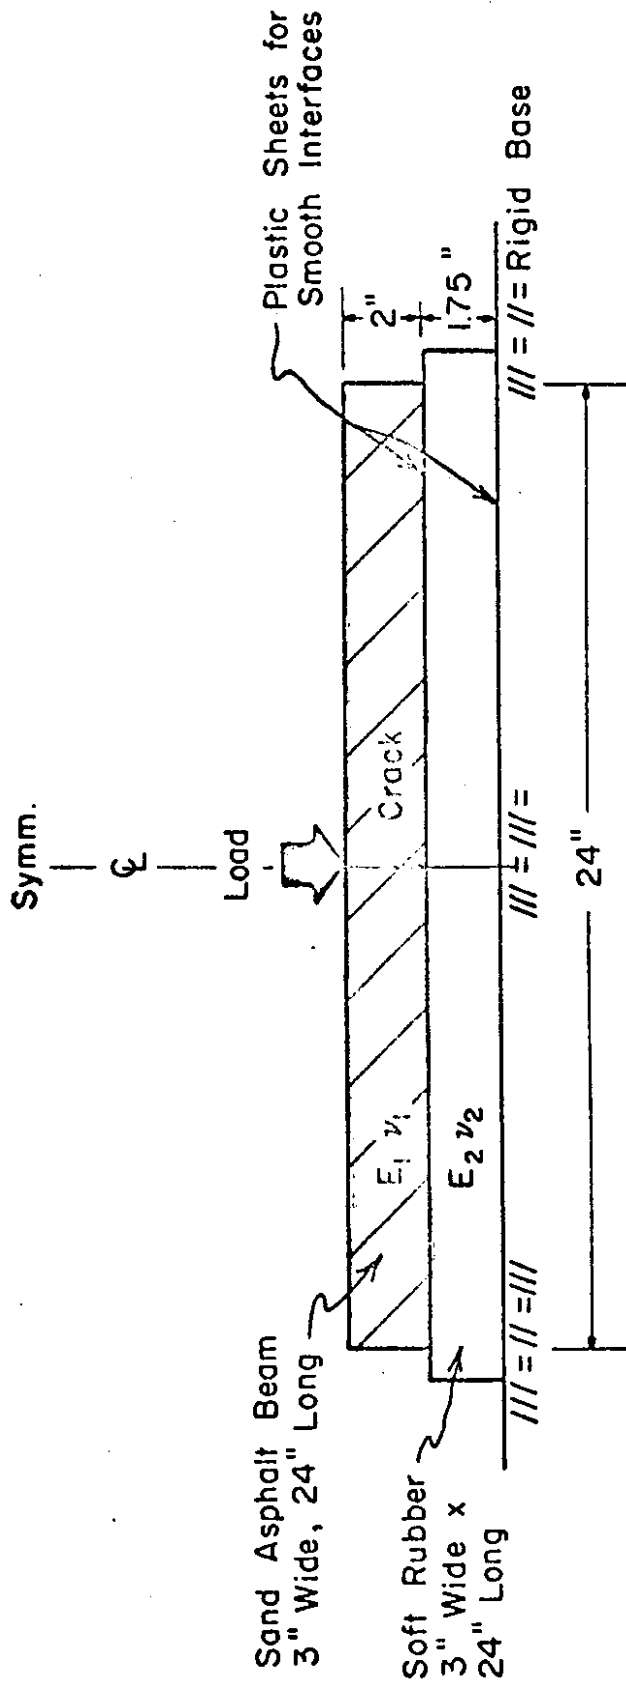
TEST SPECIMEN ARRANGEMENT FOR BEAMS ON AN ELASTIC FOUNDATION (21)
